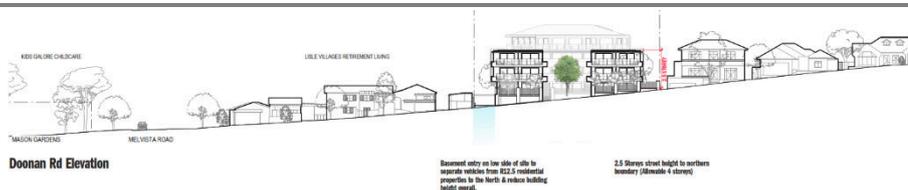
Doonan Road elevation illustrating façade presentation as two Nedlands “houses”.
